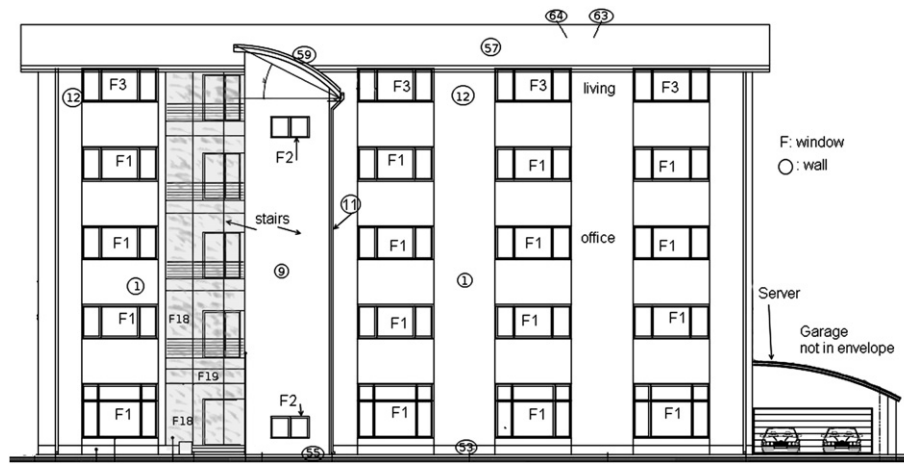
Numbered windows and external walls on the south facade of AMVIC office building.
